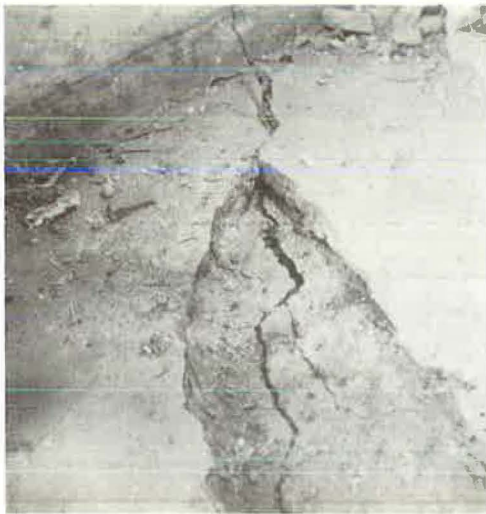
Breakage of foundation and foundation beam caused by crack through soil under foundation.
